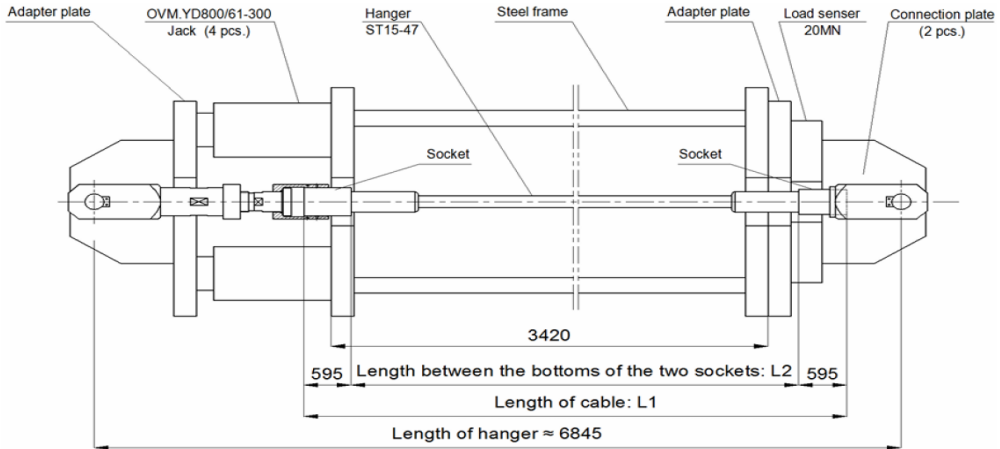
General arrangement and principal dimensions of the full-scale static tensile test assembly
